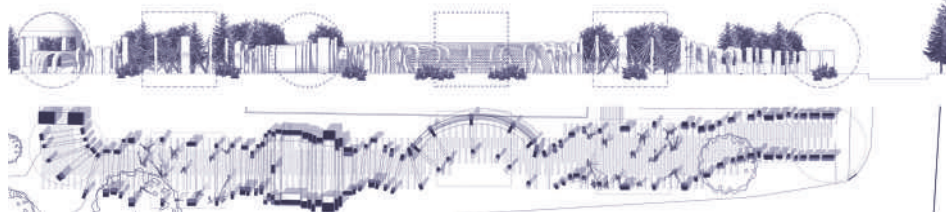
Elevation and plan of the multi-sensorial new space (author JH)
